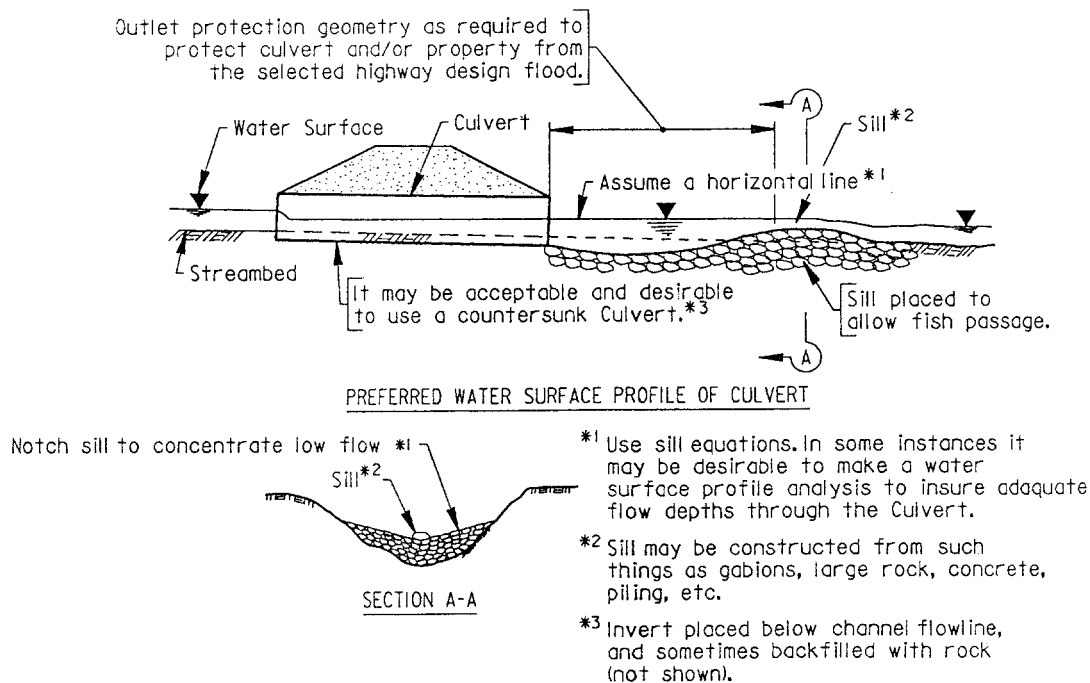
Sill Criteria at Culvert Outlet
